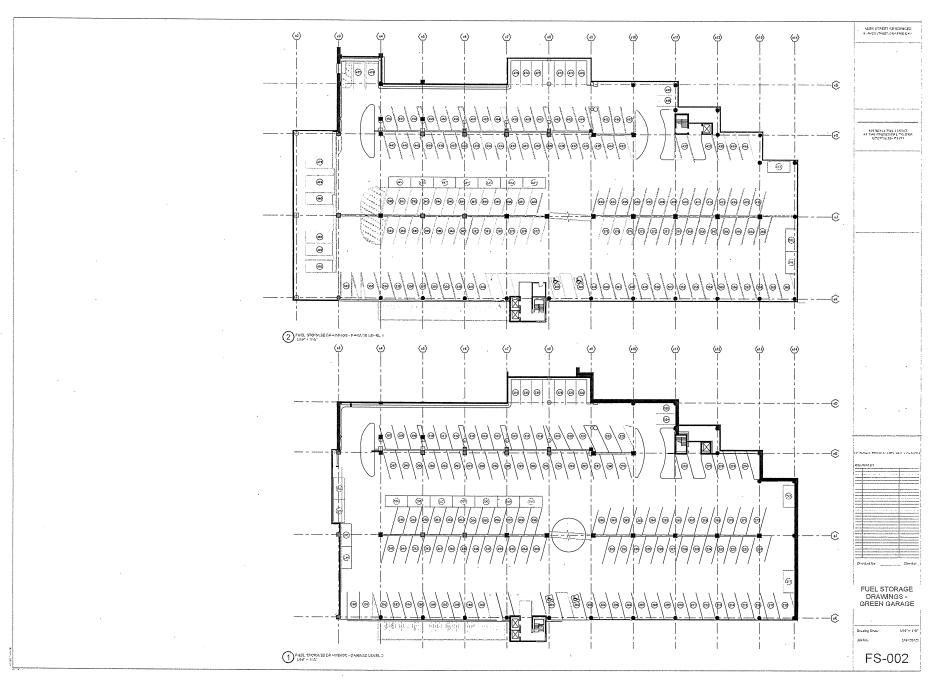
Proposed Layout Green Garage (824 Spaces)
